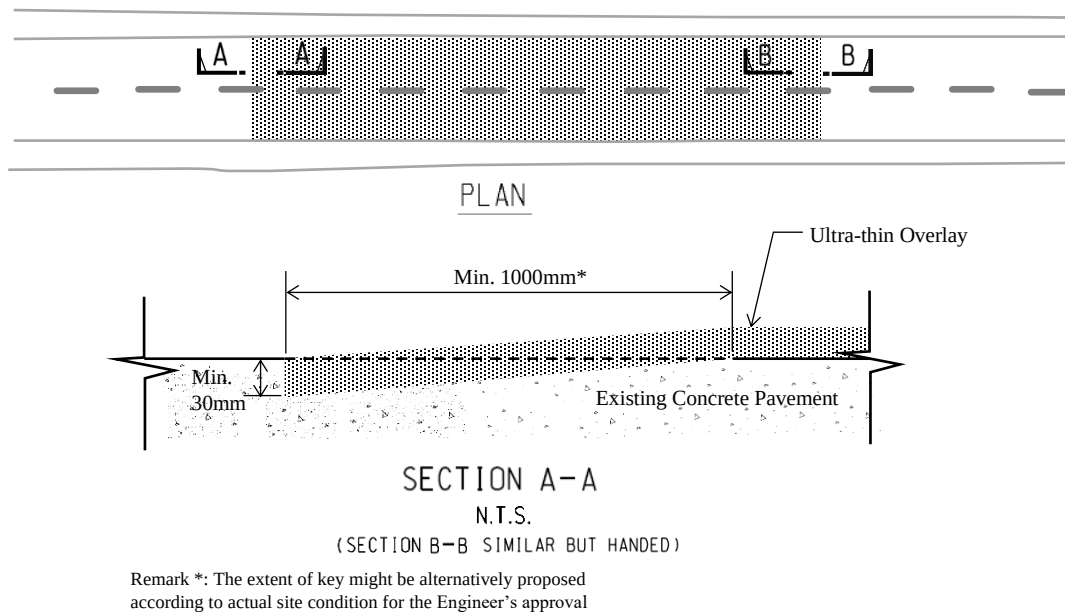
Typical Construction Details of Key for UTO on Concrete Pavement
